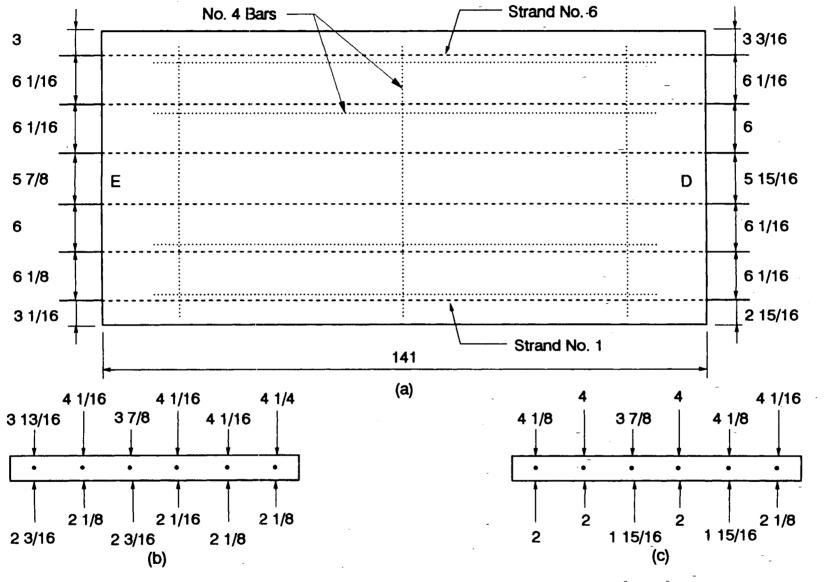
Specimen No. 15-6.0DU-3 (dimensions shown in inches):
